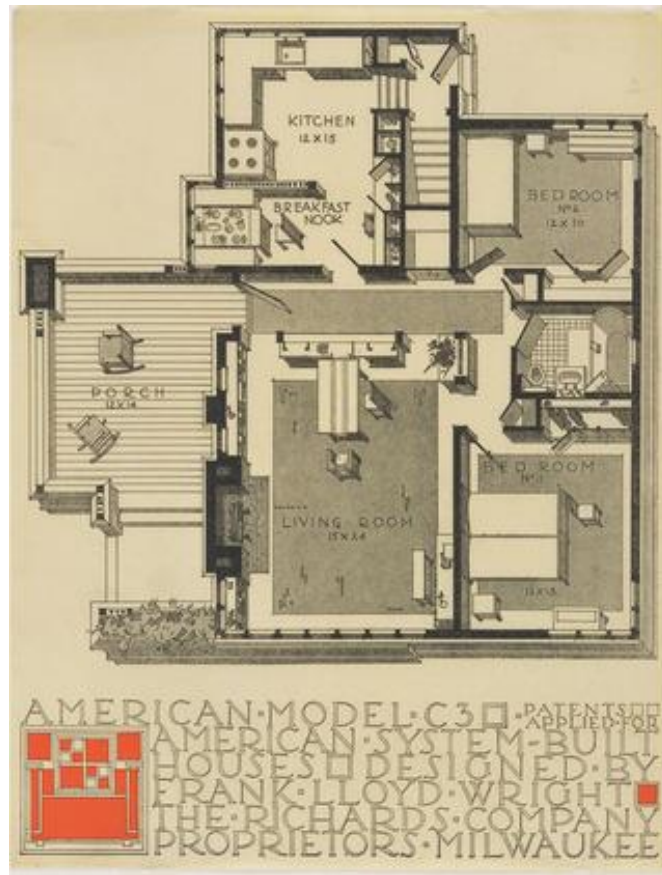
American System-Built Houses. Plan of model C3 (1915-17)
